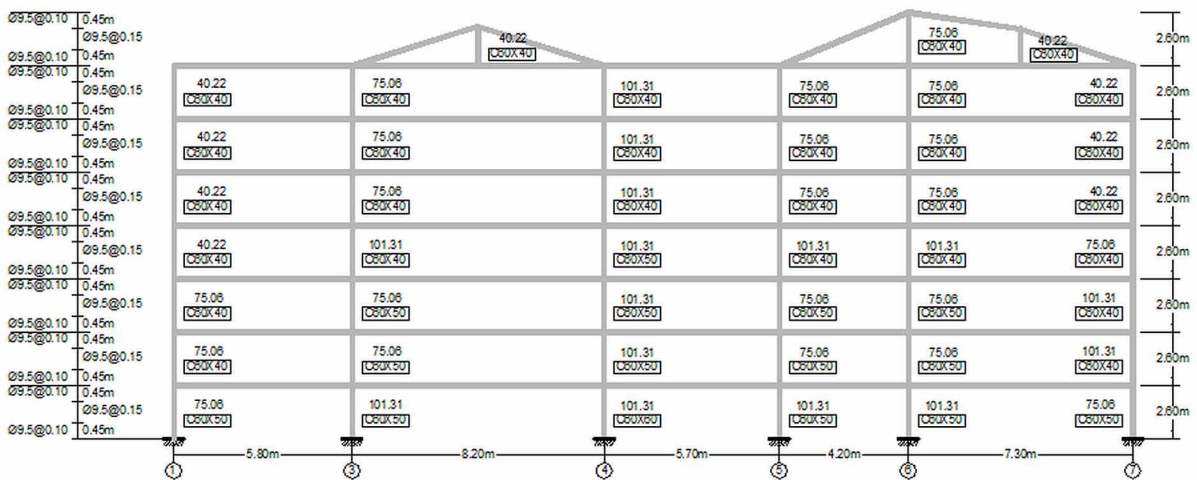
Residential building, geometry and reinforcement in beams of the frame C
